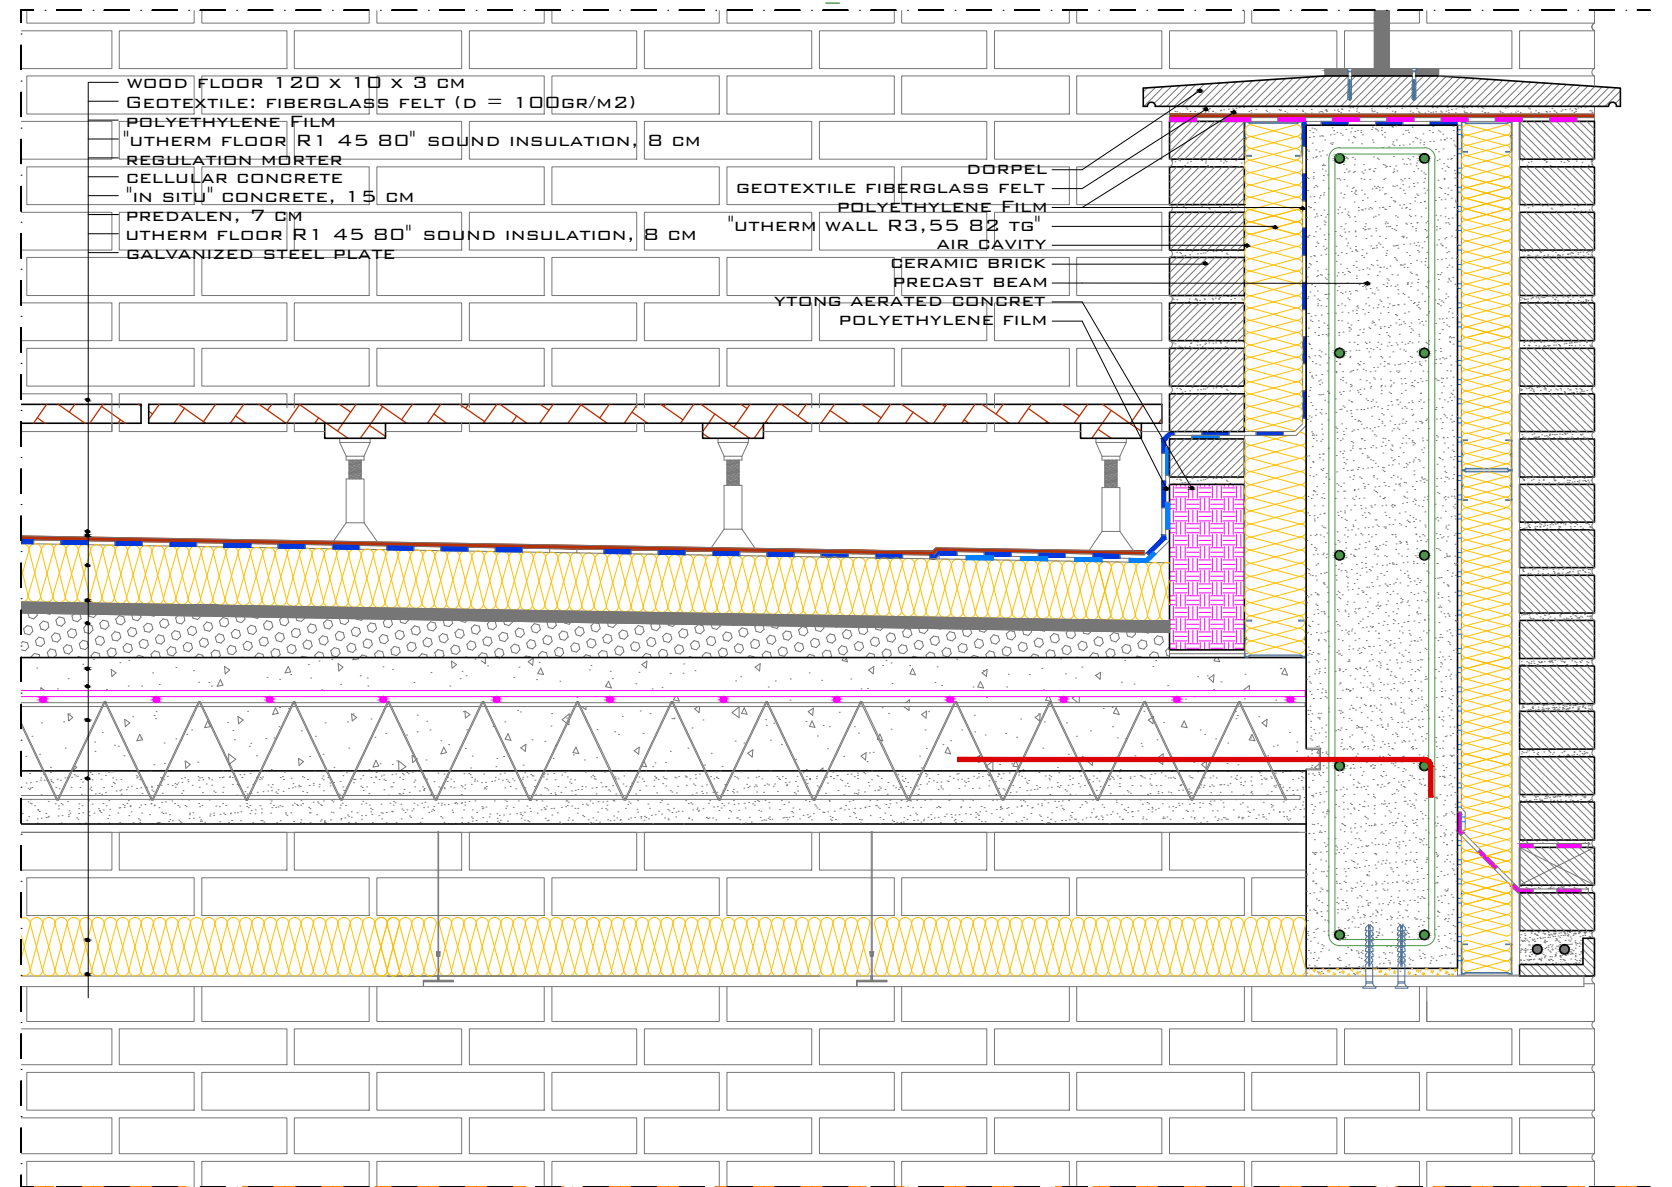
BOTTOM WALL - FLOOR \_ S:1/5
